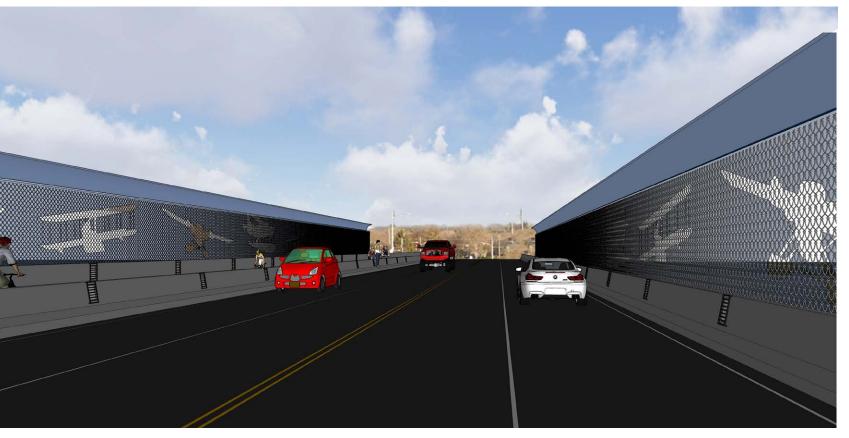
EXISTING SELLARS BRIDGE LOOKING EAST OVER I-75.
